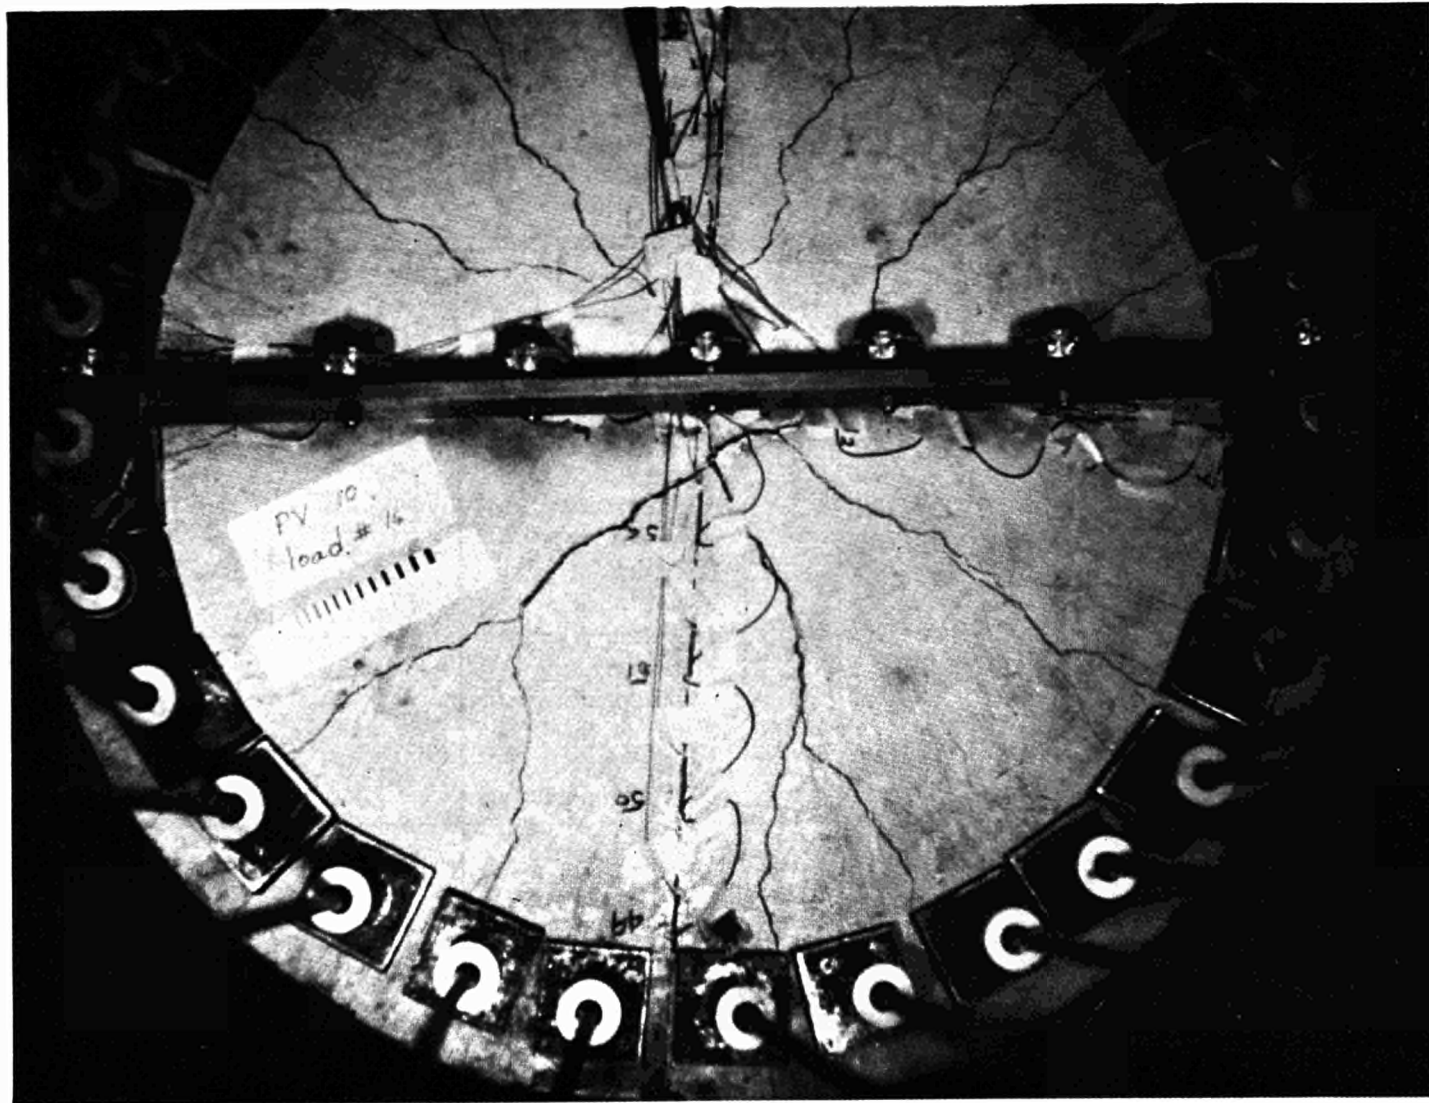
End Slab Cracking Pattern for Flexural Failure
